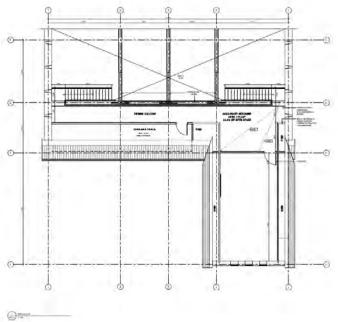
Proposed Site Plan (Source: Fryett Turner Architects Inc., 2022).
